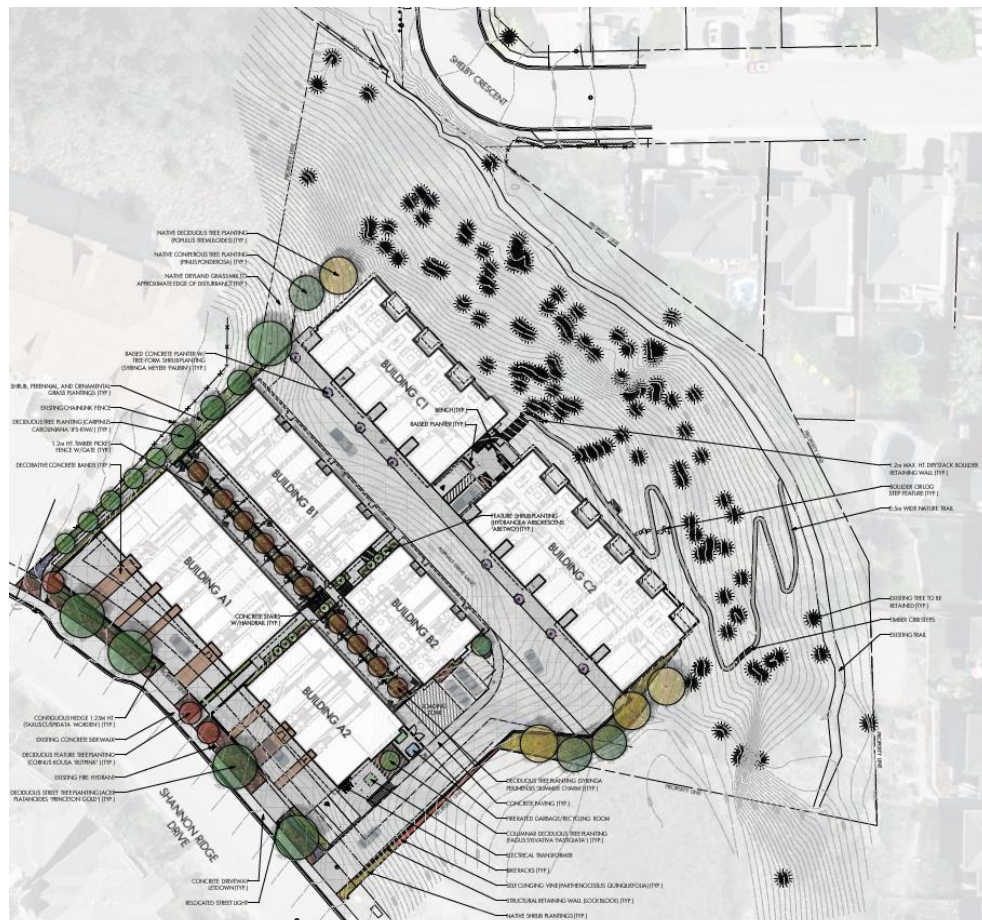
Site plan showing development concentrated on the top of the site to retain natural vegetation, and landscaping throughout the development.
